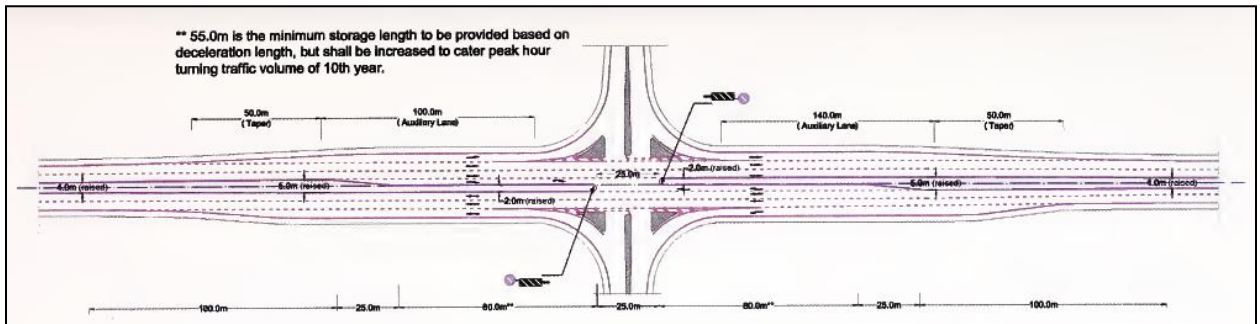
Layout for Cross Road Intersection (with Right Turn Protected Arrangement)
